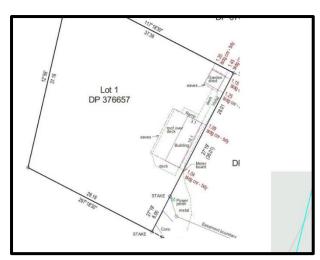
Site Plan showing location of dwelling and garden shed as well as length of buildings and setback distances.
